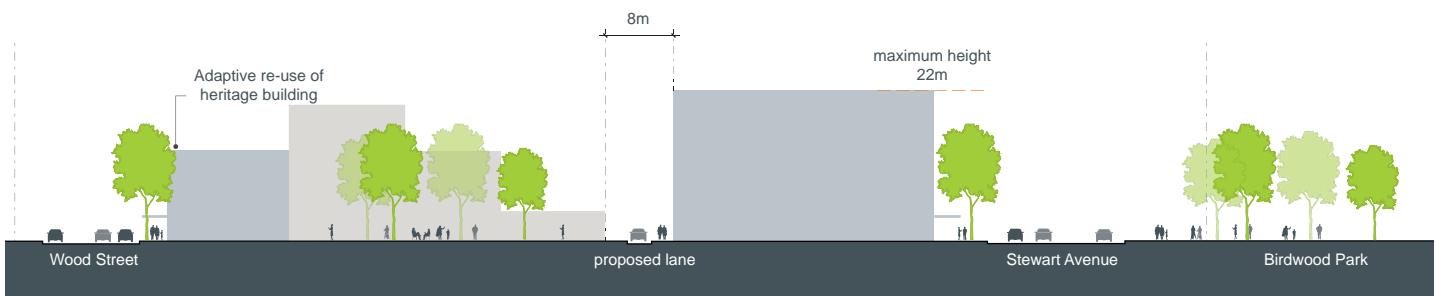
Section through the former brewery/regional museum site between Stewart Avenue and Wood Street
